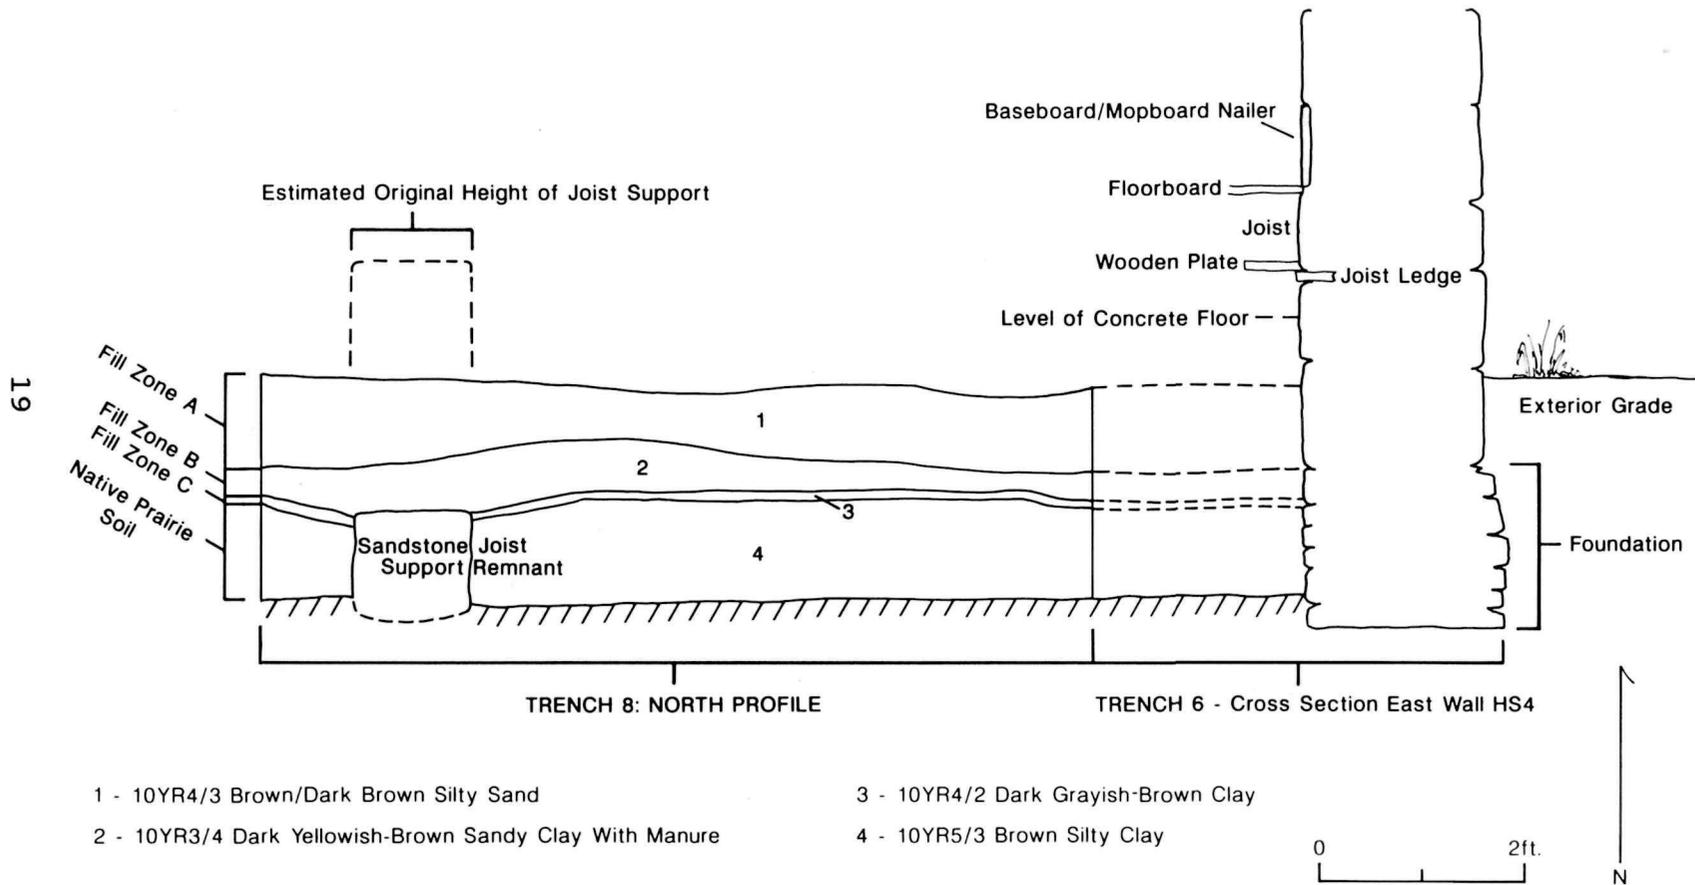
Trenches 6 and 8, north profile, with cross section of east wall and estimated original height of joist support.
